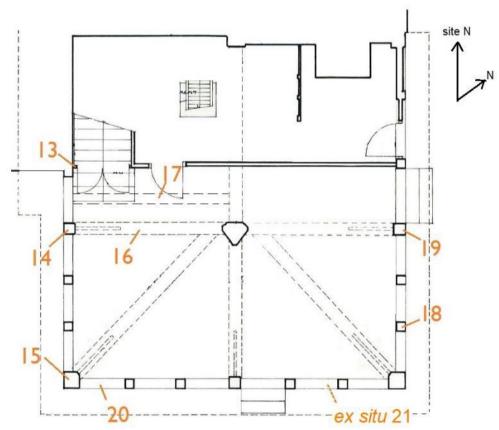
Ground-floor plan, showing positions of the timbers sampled for dendrochronology (adapted from Essex County Council plans drawn by R Crowe, 1974)
